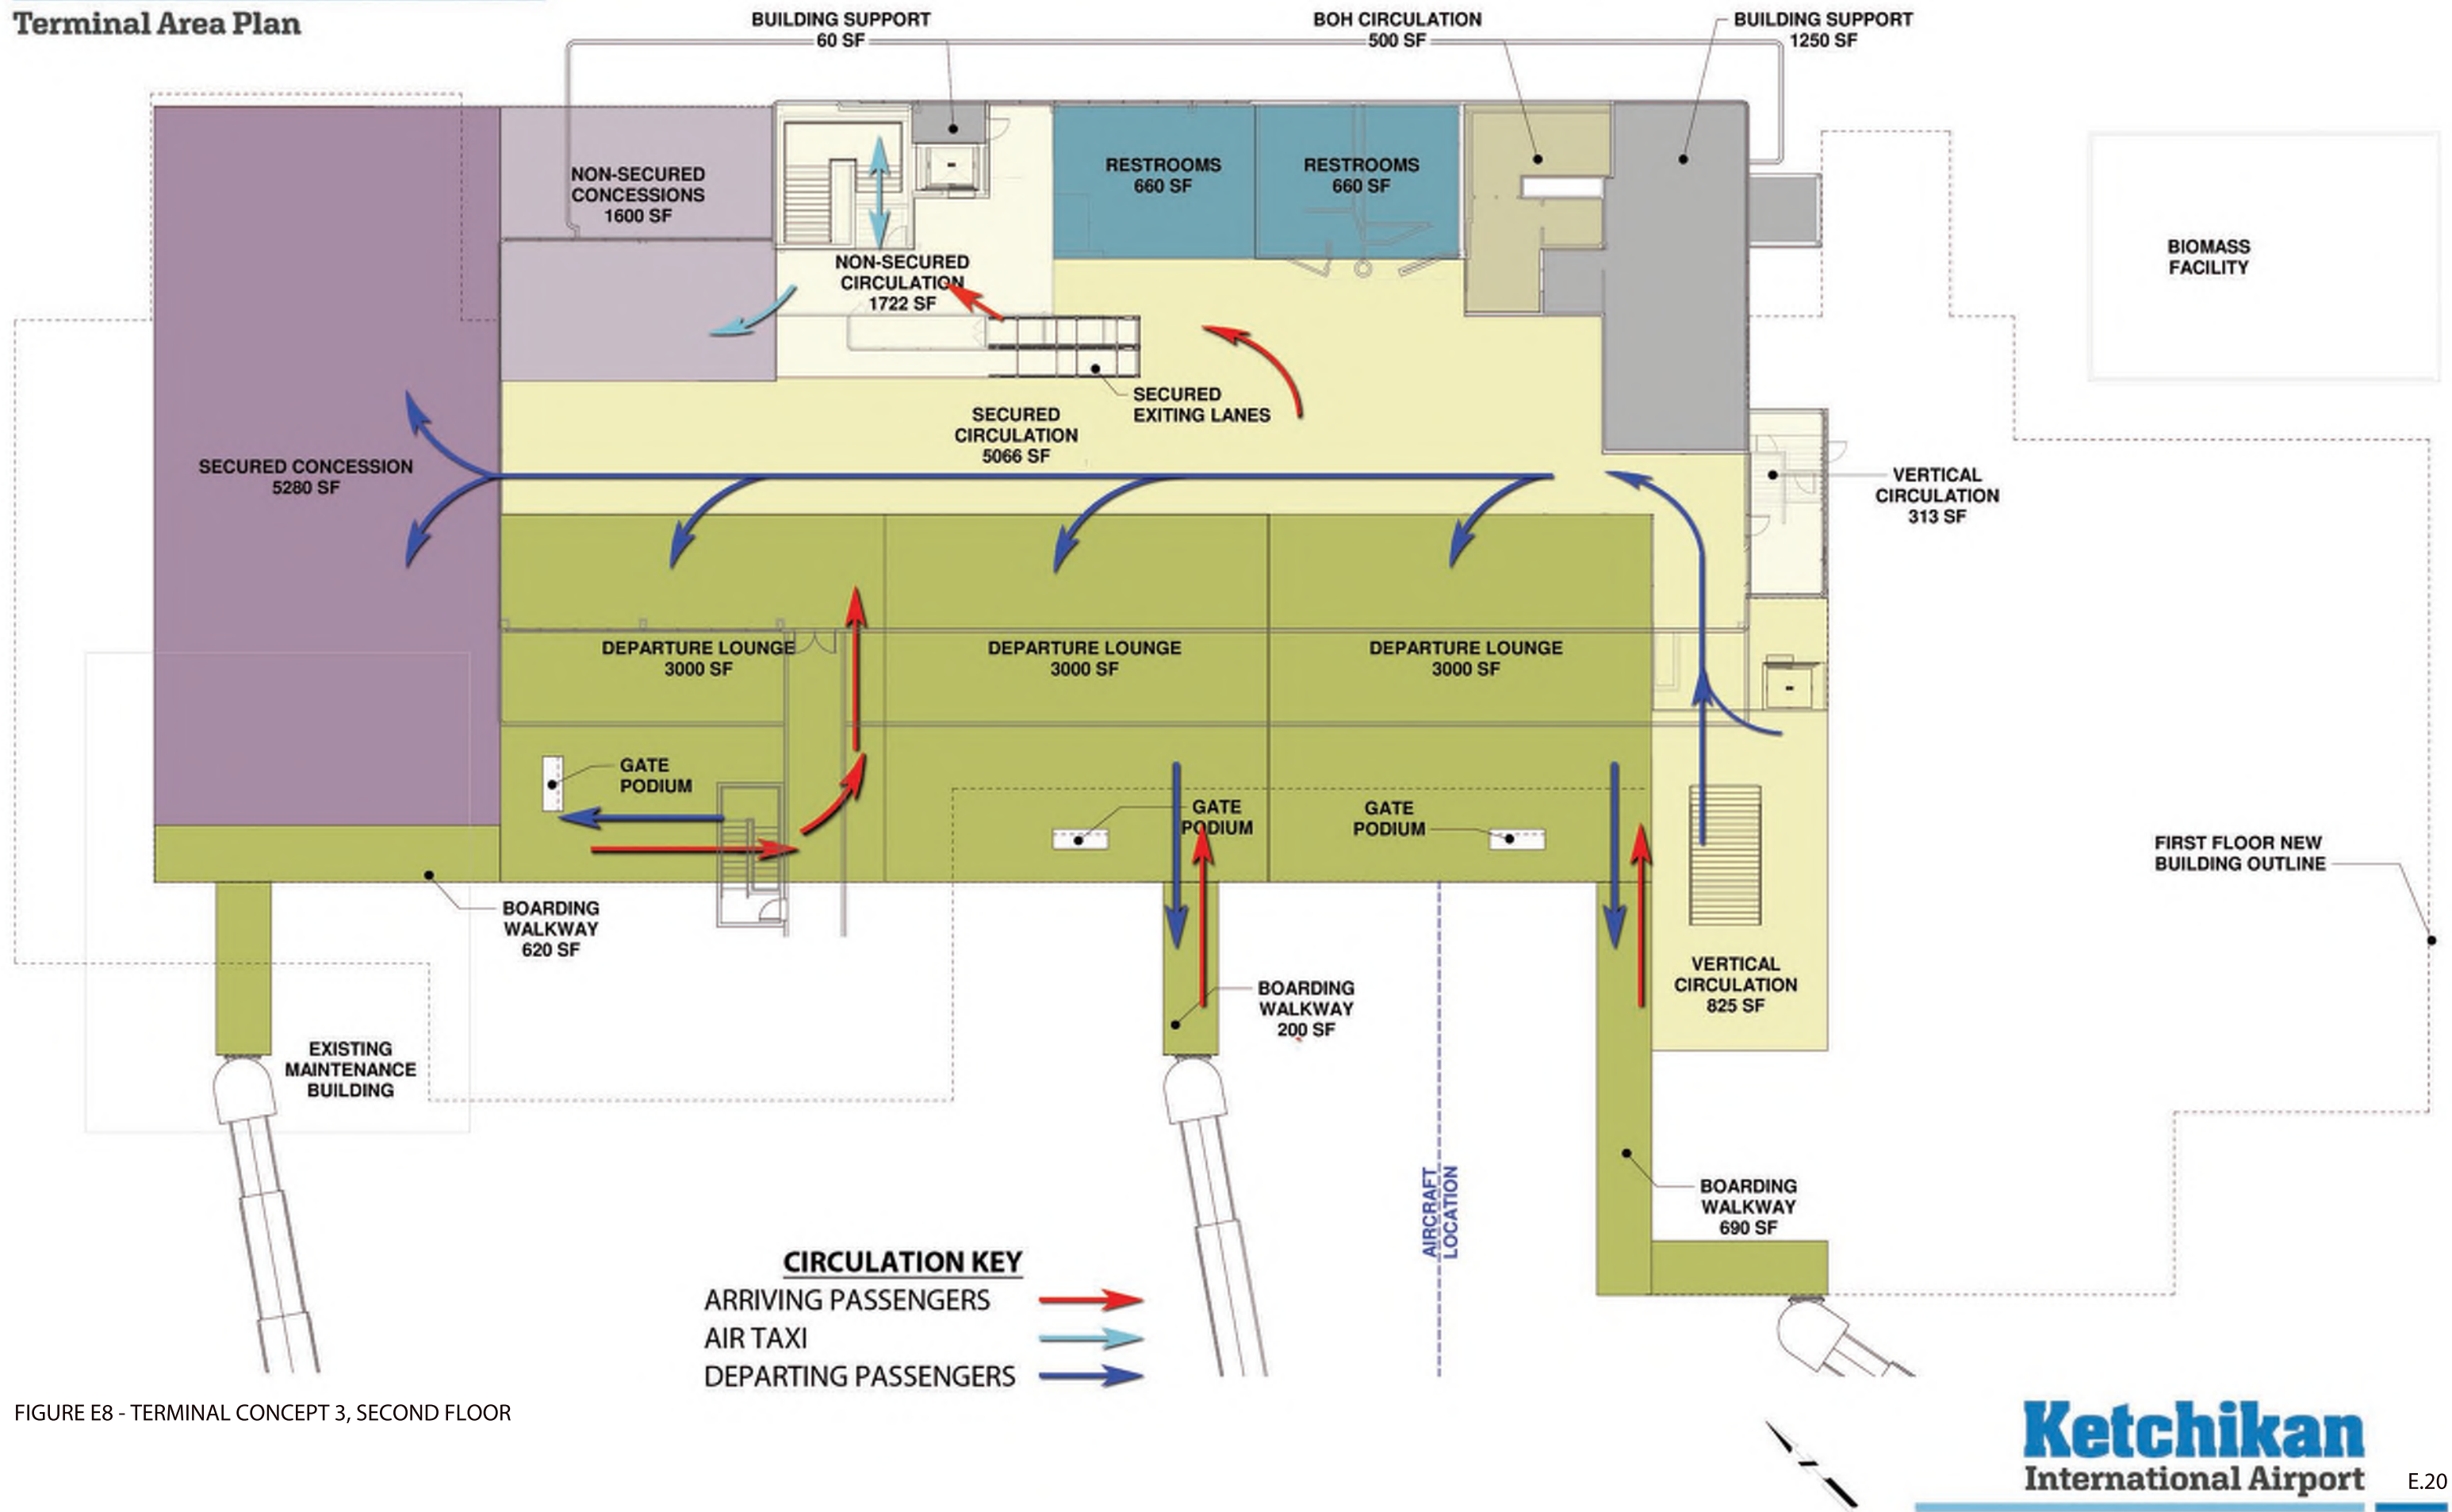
TERMINAL CONCEPT 3, SECOND FLOOR
